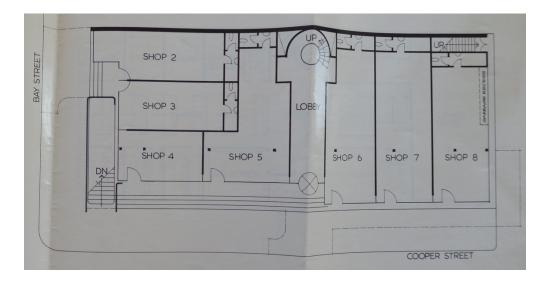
, DA Plans 1969. Ground Floor. Principal Entrance and Shops showing a revolving door at the entrance to the lobby. The ground floor plan shows Shop 2 and Shop 3 facing Bay Street, accessed from a short flight of steps and platform. An enlarged awning protruded into Bay Street to herald the entrance to the 2 shops (not shown on Plans but shown on the Section). Shops 4 and 5 are accessed from a generous podium set back from Cooper Street, as is the main entrance to the lobby leading to the offices upstairs. It appears that a revolving door was
